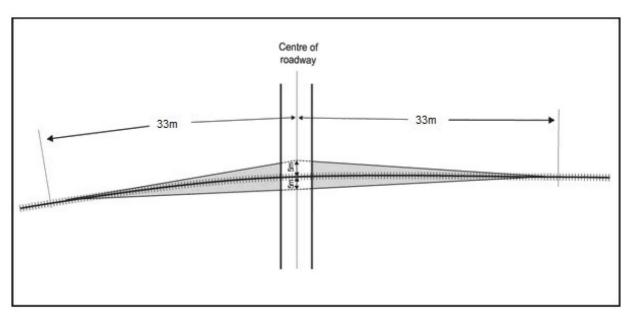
Restart sight triangles for public road/rail siding level crossings.
